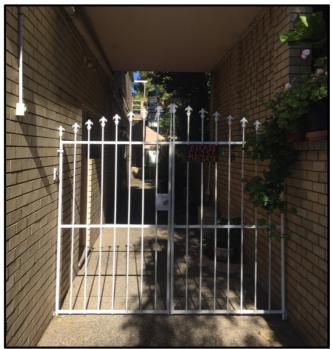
Photograph taken during the site inspection showing the western side setback of the building where the two car parking spaces were to be located under the previous DA No. 147/86.. Noted in this image is the narrow width and gate which would make parking in this areas unachievable. As such, it is considered application of the condition recommended by Council would be impracticable.
